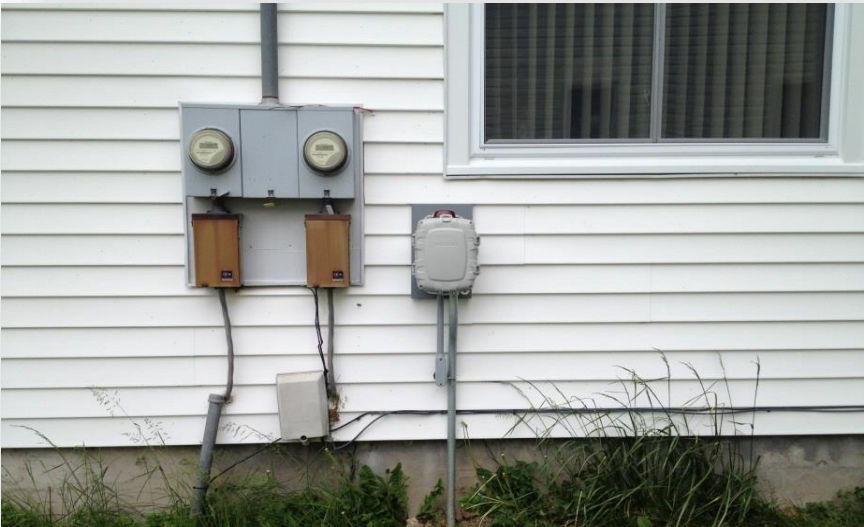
TYPICAL GRINDER PUMP INSTALLATION DETAIL
